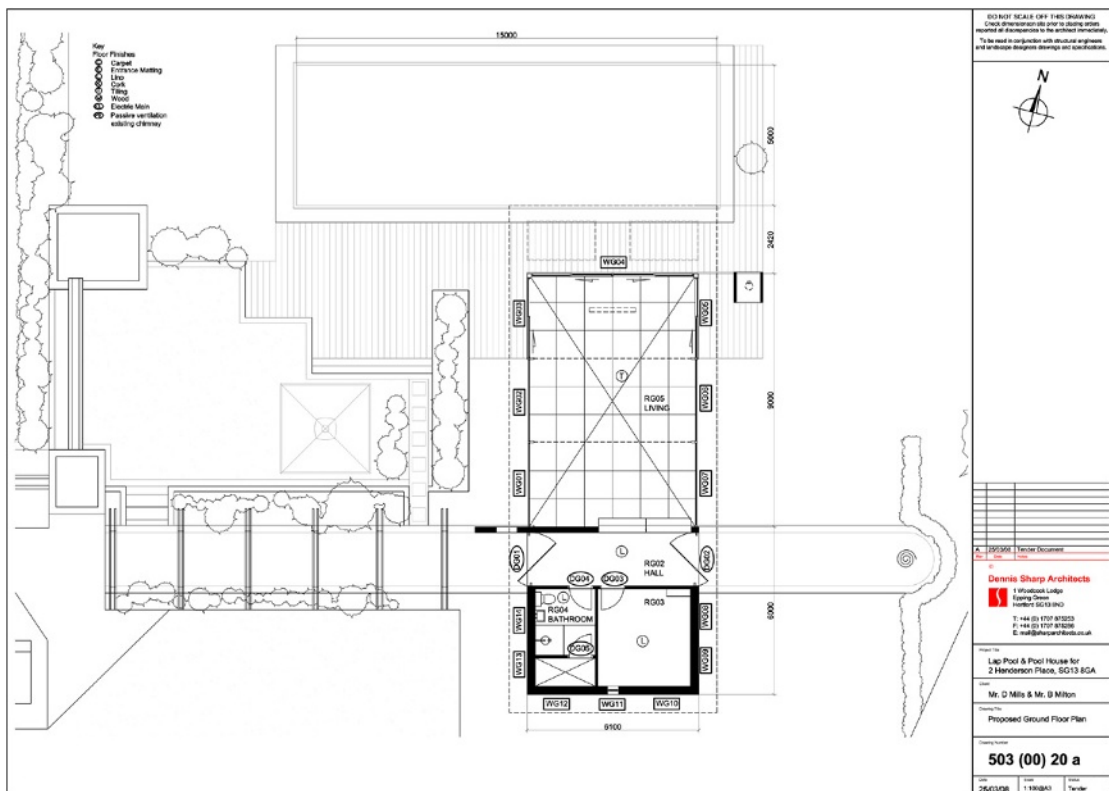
Ground floor plan. This is a typical layout drawing which can be developed in Microstation, Auto-cad, Vector Works or similar CAD packages. Architecture students must get familiar with this way of representation and drawing format as this is standard in architectural practices.
